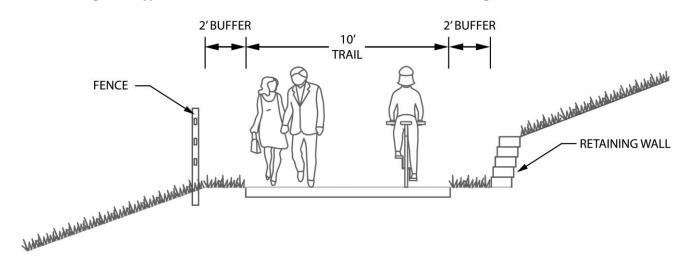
Typical Old Cameron Run Cross Section in cut condition with Retaining Wall
